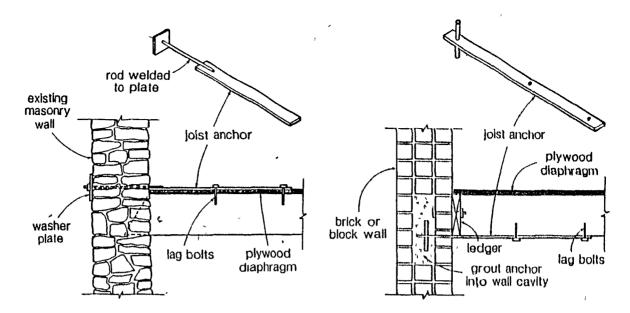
Cross-Section of Anchorage Details of a Plywood Floor Diaphragm to a Masonry Wall¹³.
